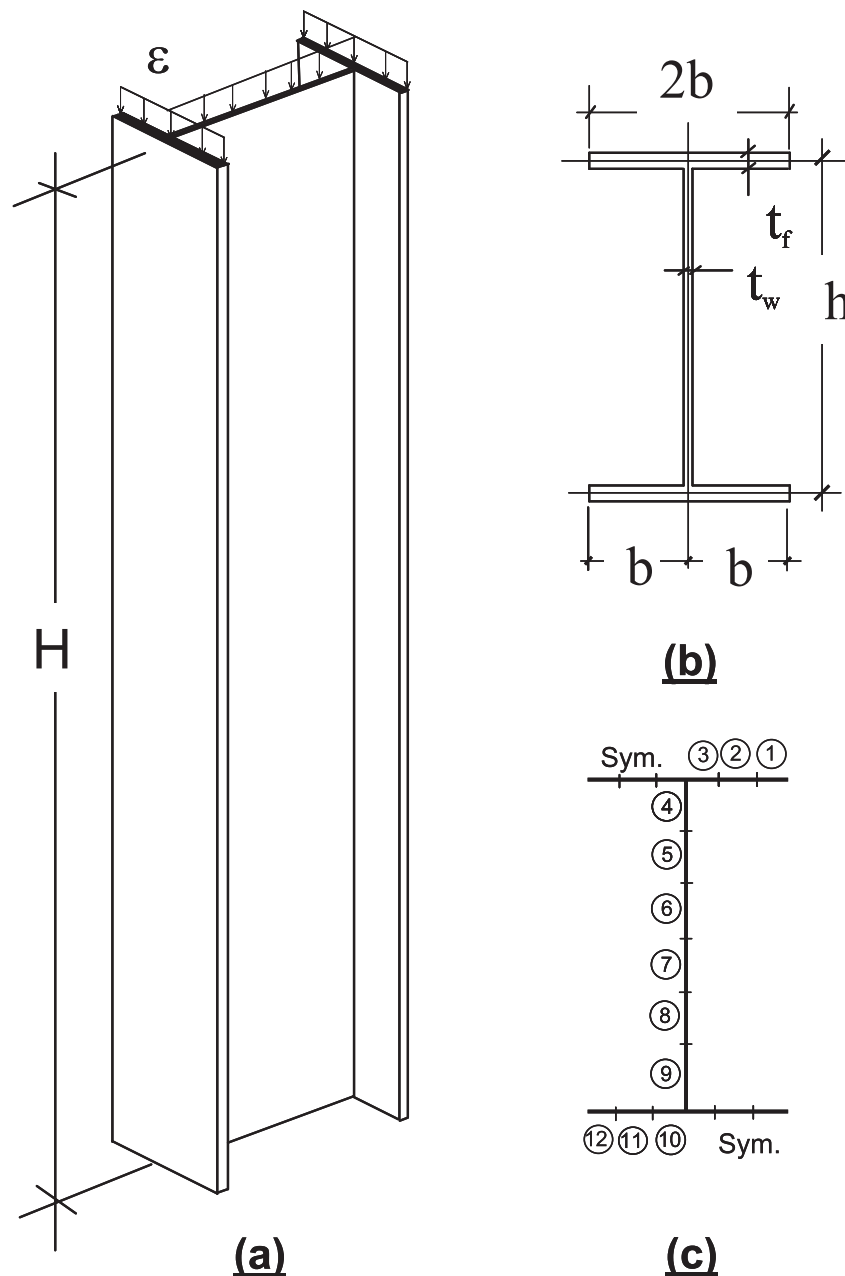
Modeling of an I-section column (a) Loading pattern (b) Cross section dimensions (c) Modeling of the section as connected plates.
